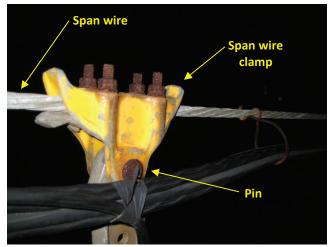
Moderate corrosion on span wire clamp bolts and pin at leveling assembly connection
